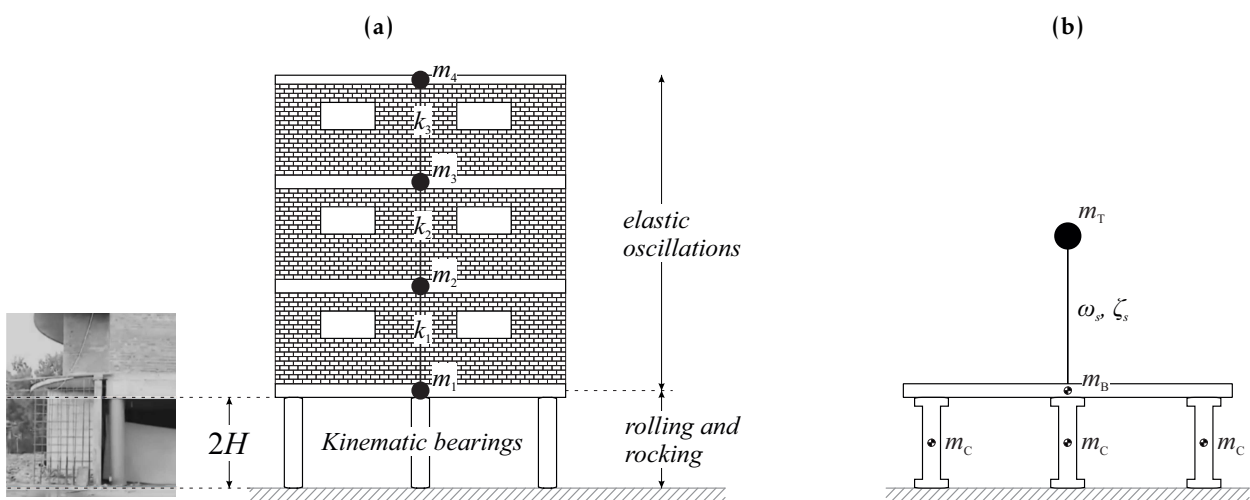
Rocking podium structure: (a) Masonry building isolated on a rocking ground floor [103]; (b) Dynamic model: initial position.
